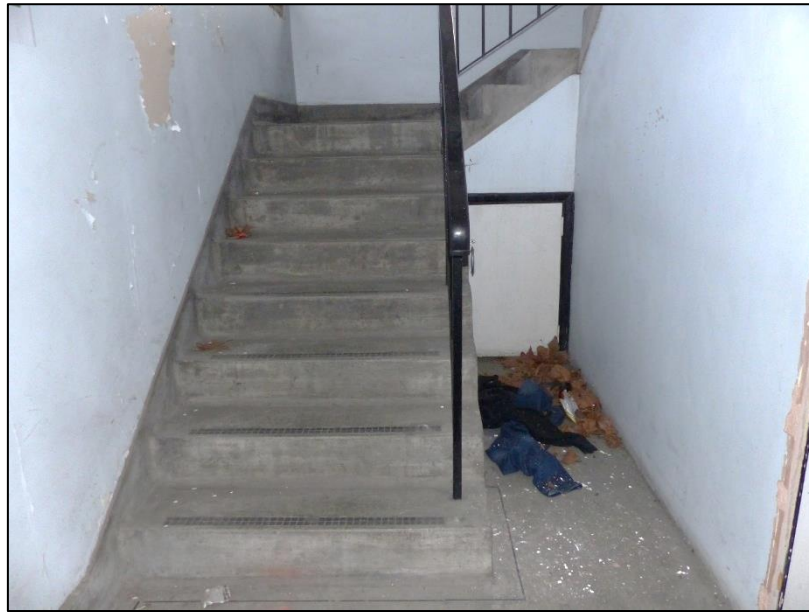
The eastern stairs leading from the first floor to the upper levels, looking south P1400339
